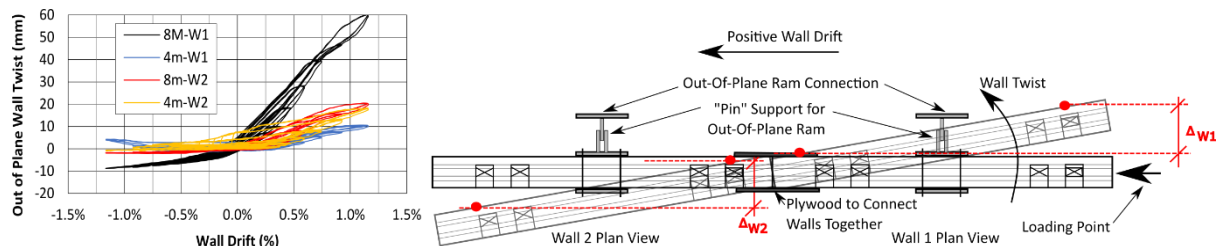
DW testing wall twist at different wall heights for test DW-3
